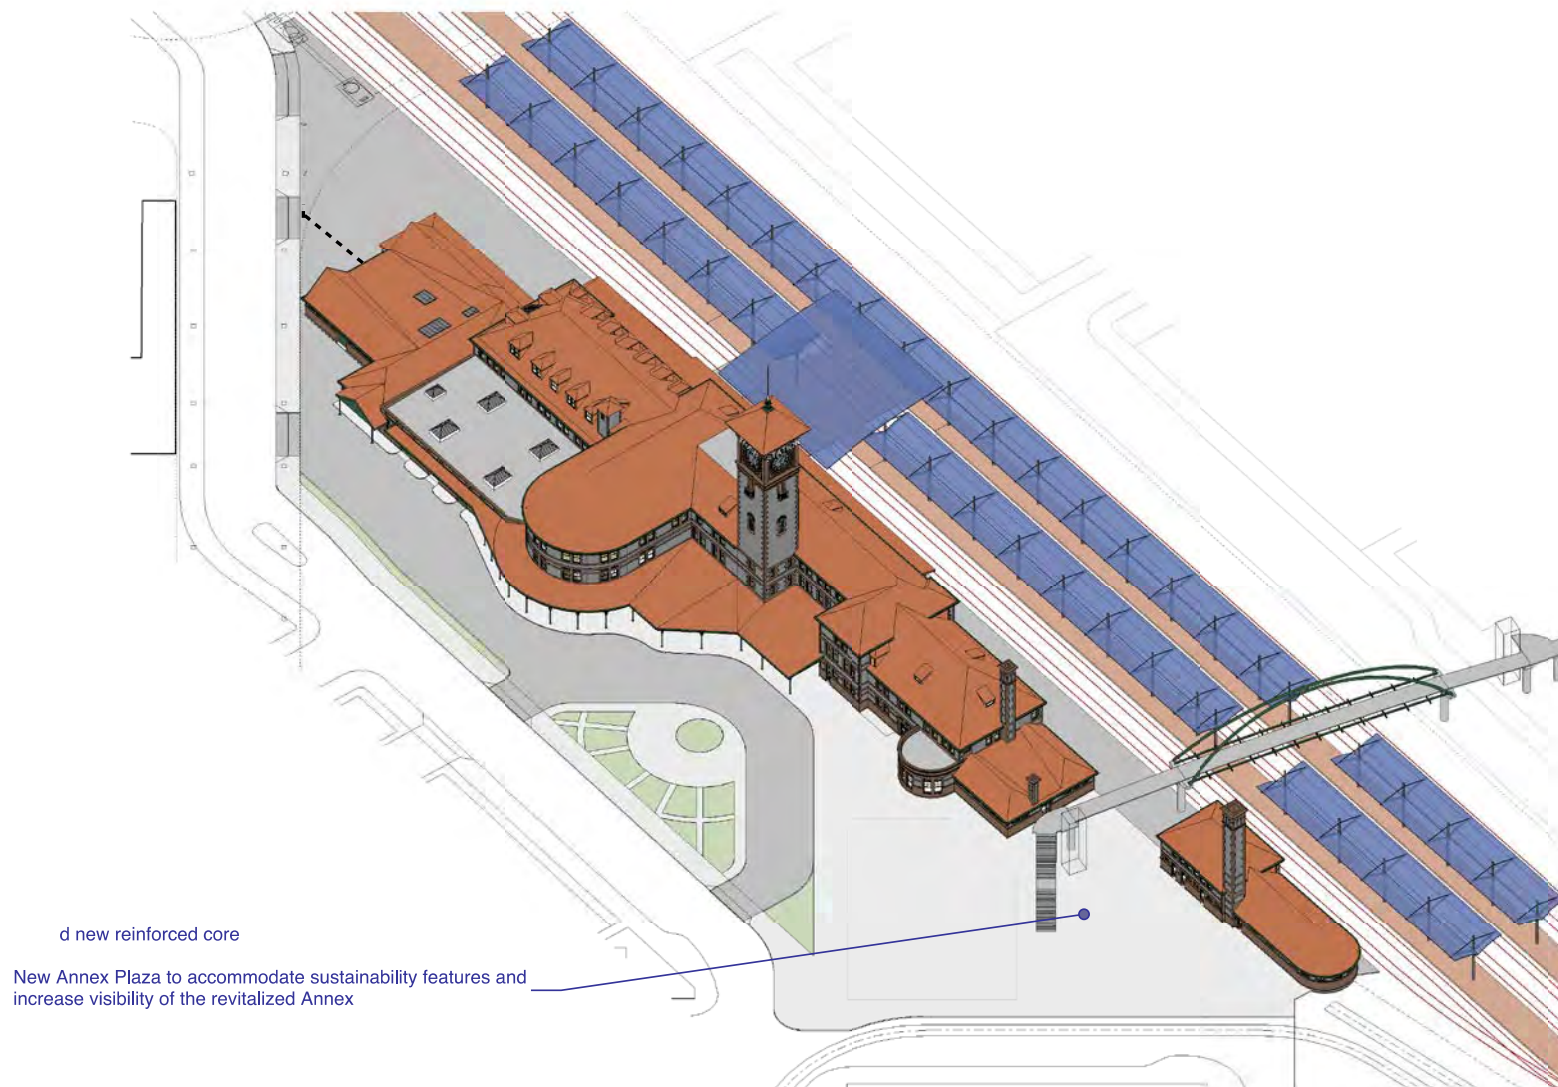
Proposed Conceptual Design Building Improvements - First Floor
